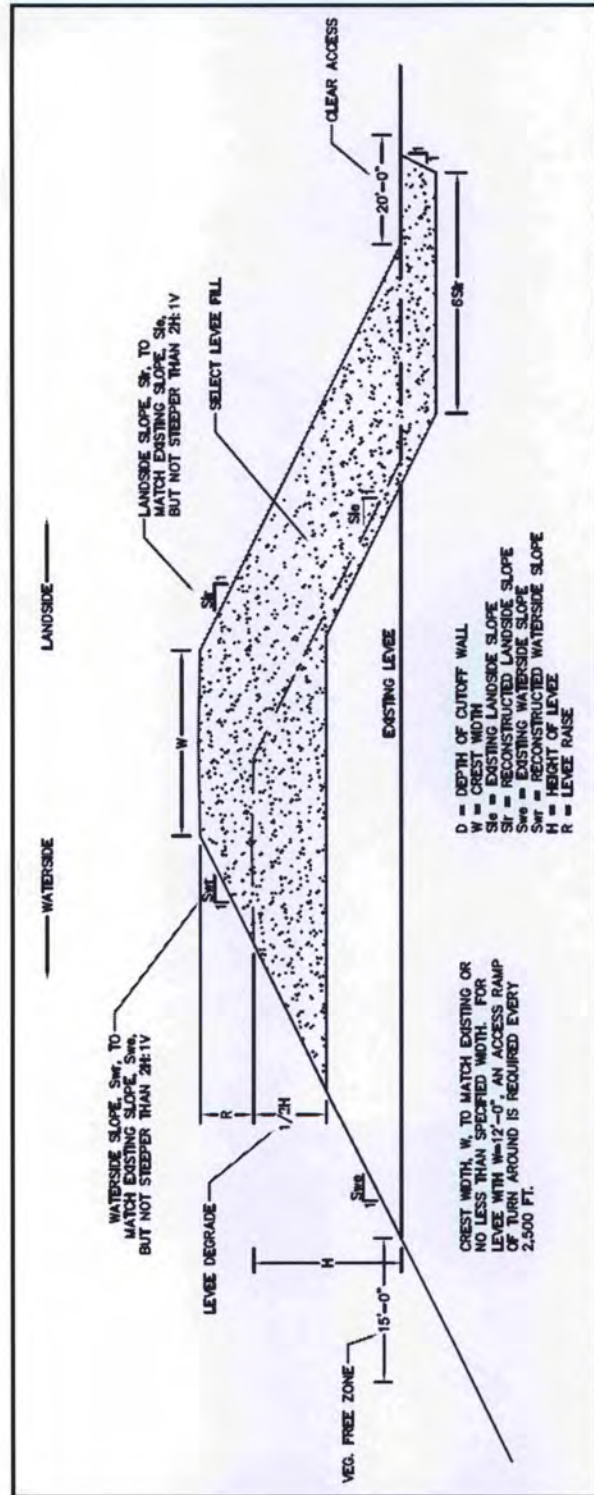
Levee Reshaping and Levee Raise Typical Plan.
